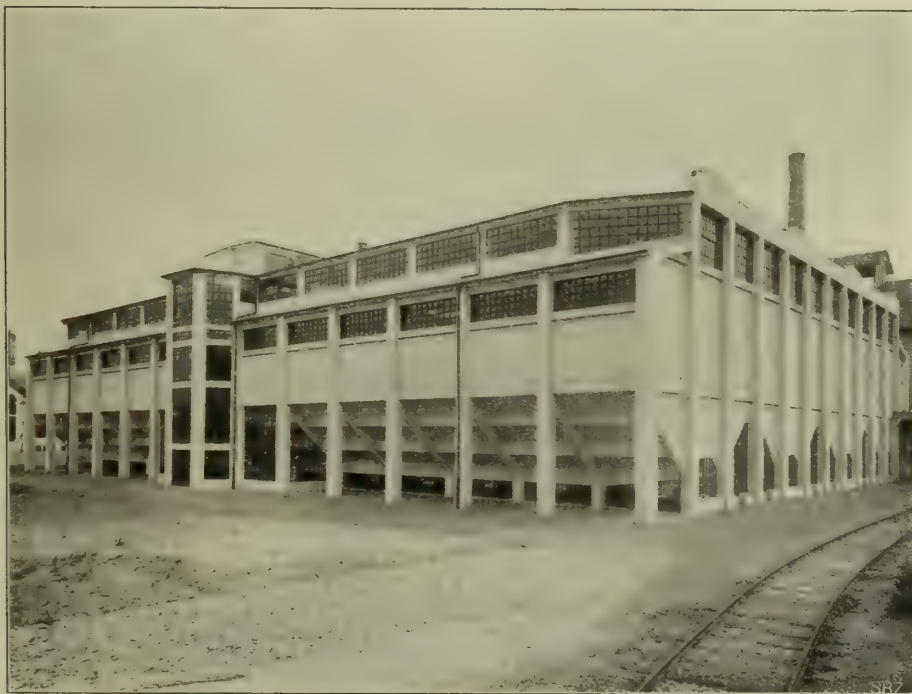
No. II. Coal-Store of Reinforced Concrete—North Side—of 13,000 Metric Tons Capacity.
